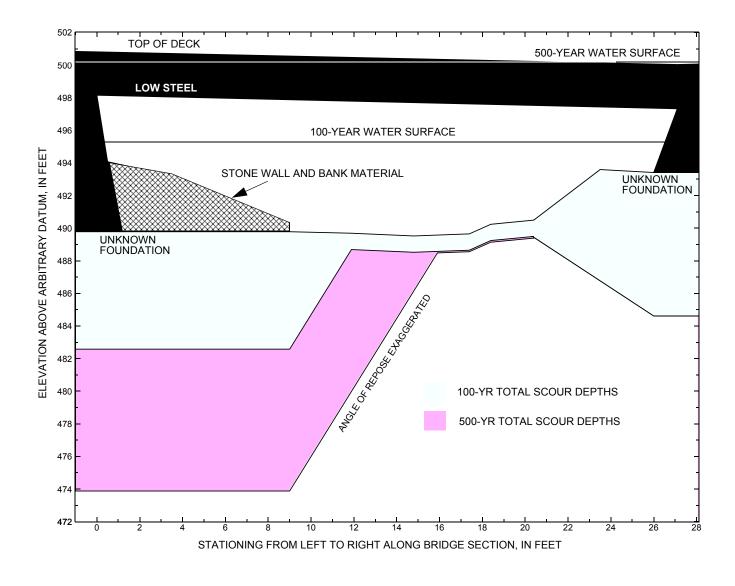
Scour elevations for the 100- and 500-year discharges at structure BRADTH00090023 on Town Highway 9, crossing Mill Pond Brook, Bradford, Vermont.
